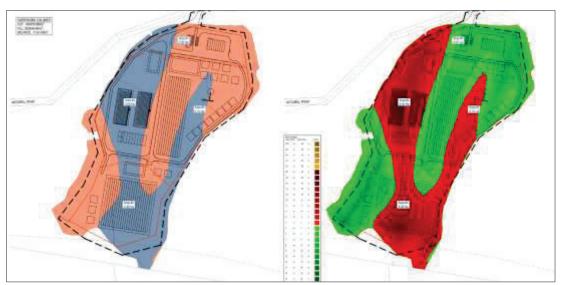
Layout and cut-fill plan of proposed development (provided by Client)
